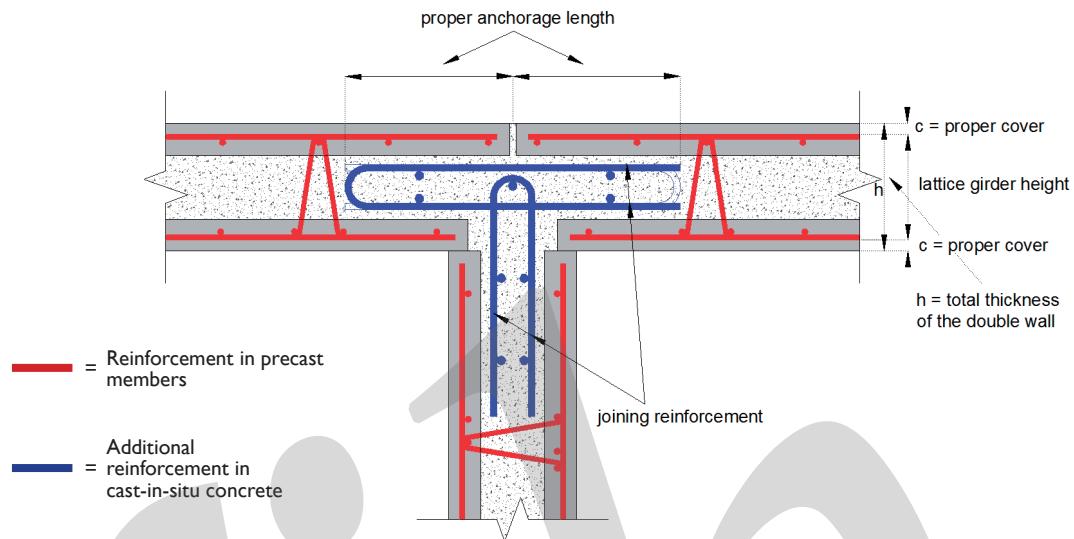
Horizontal section of connection of exterior and interior walls
